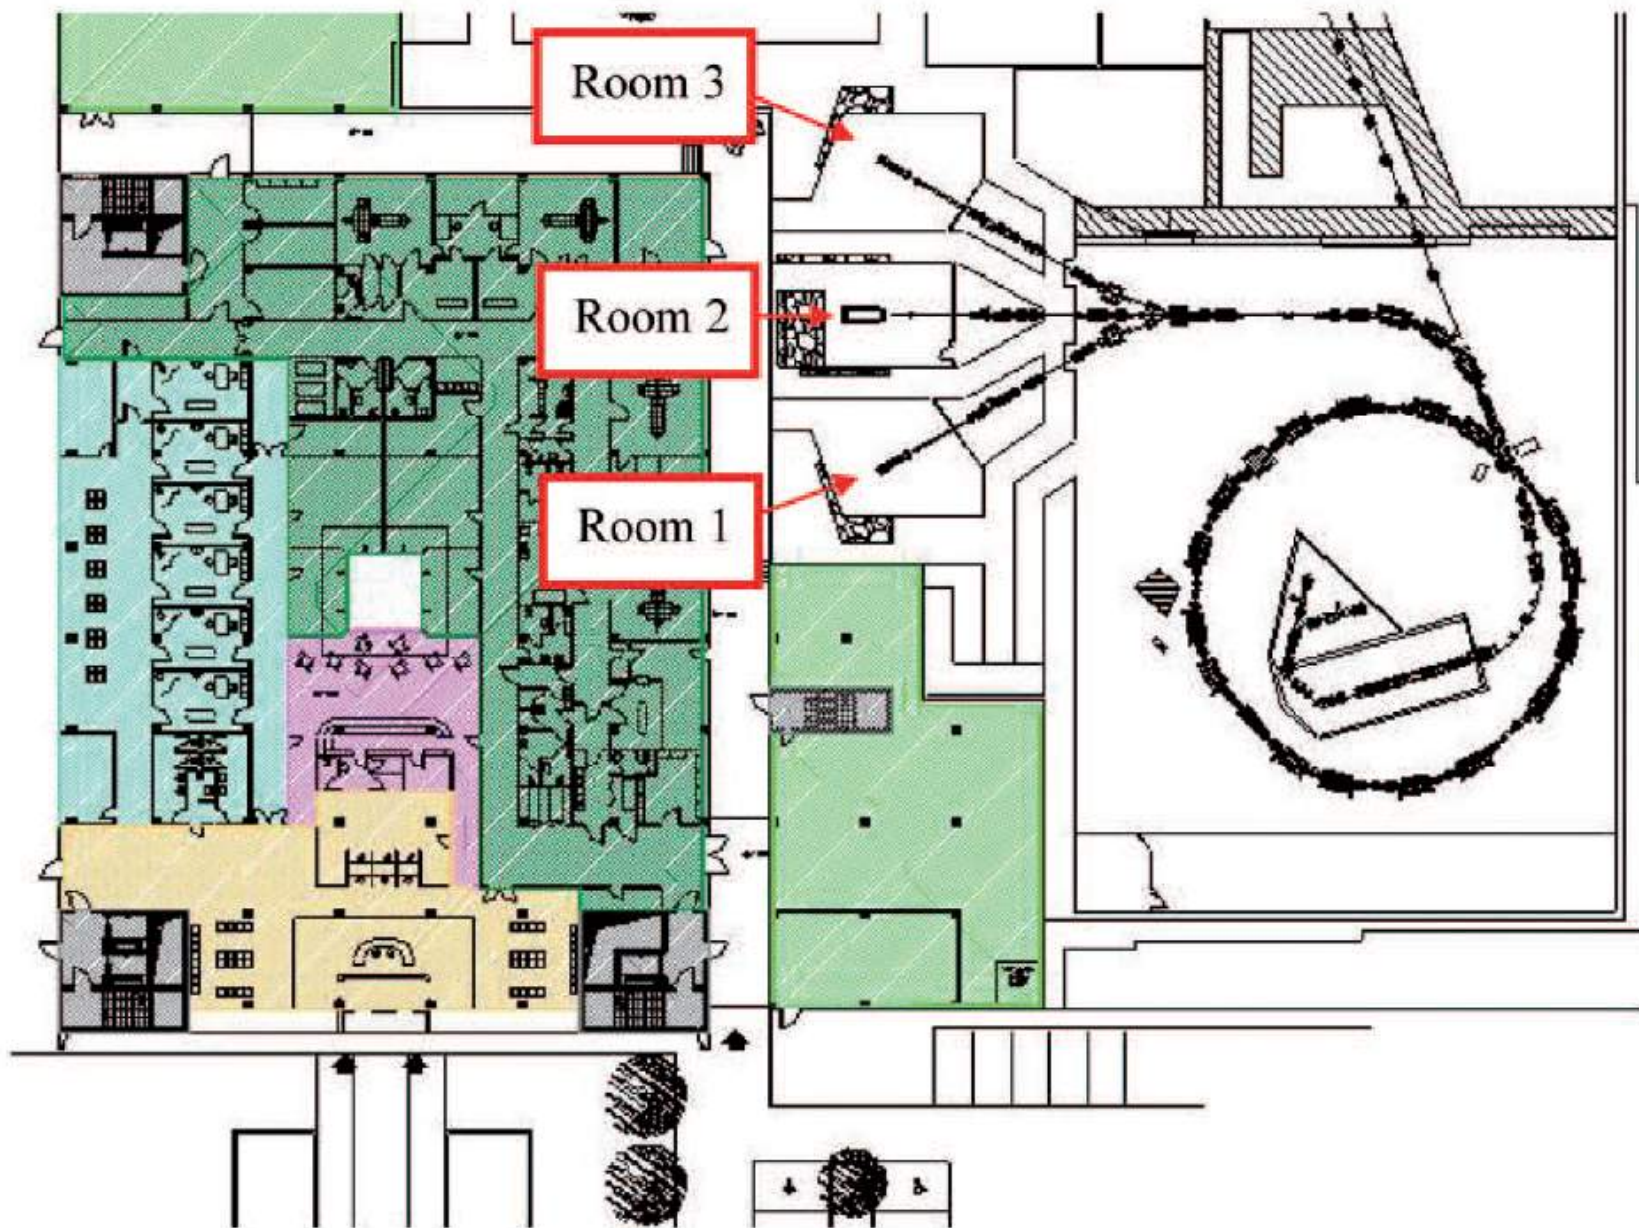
Underground floor layout of CNAO complex, showing the accelerators and the treatment rooms.
